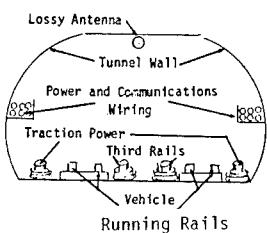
TYPICAL TUNNEL INSTALLATION
